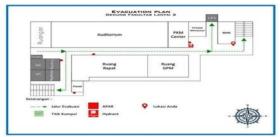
2nd Floor Engineering Faculty Building Layout
